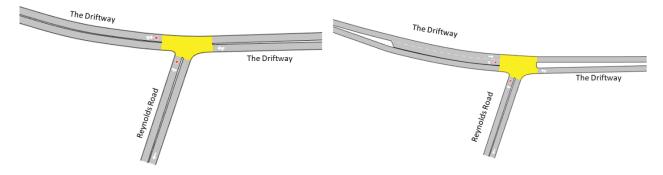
The Driftway and Reynolds Road intersection (Location 12) – Existing layout (left) and proposed upgrade (right)
